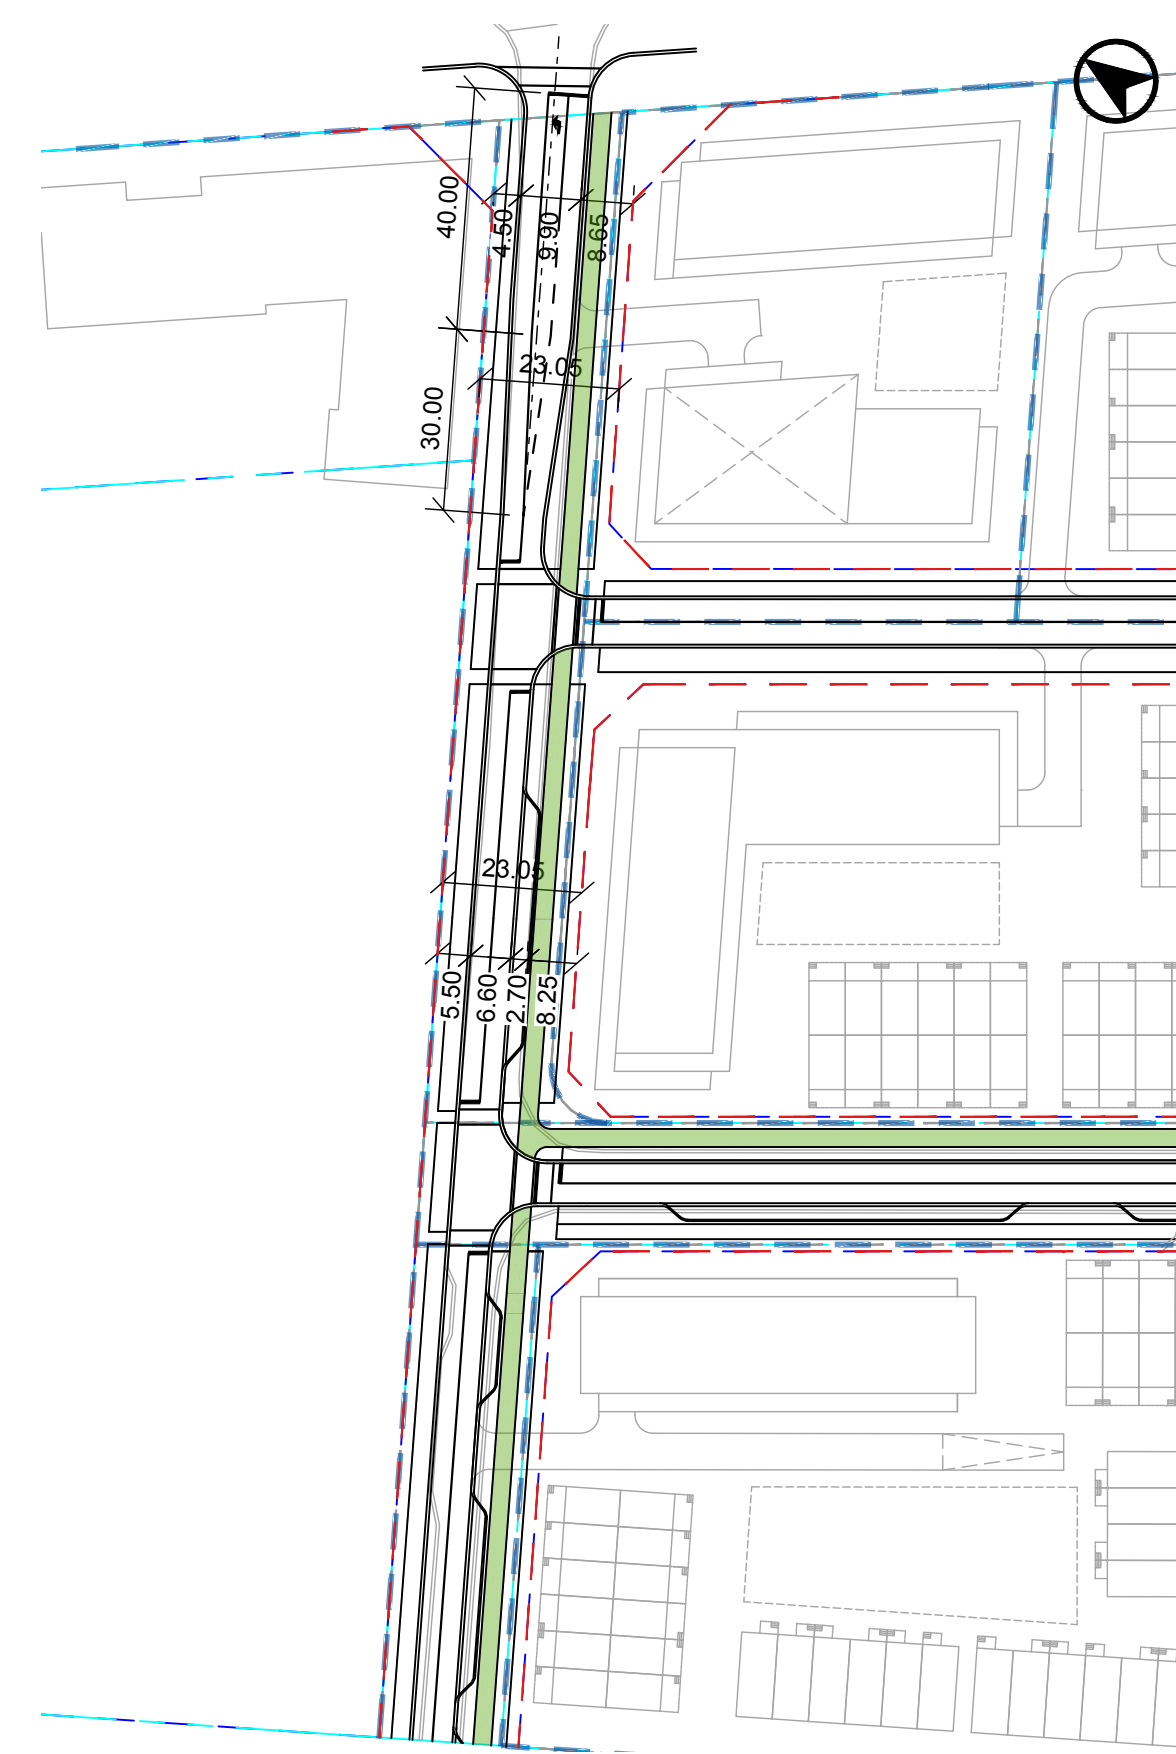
EAST AVENUE - FUNCTIONAL PLAN & CROSS-SECTIONS
